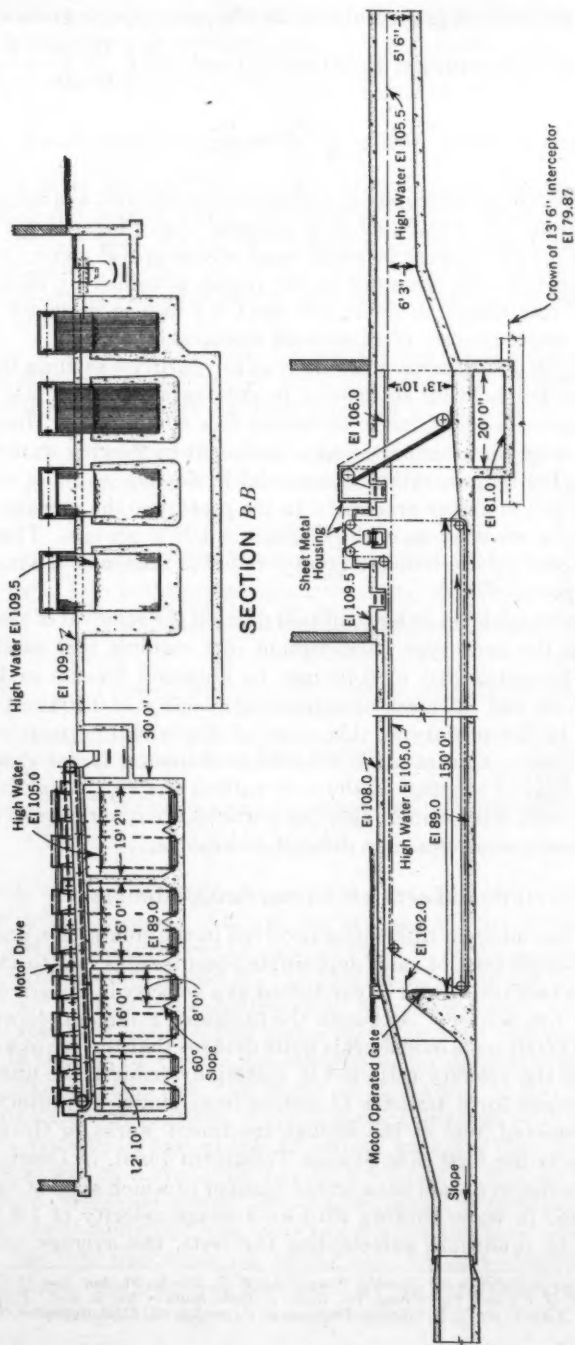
PLAN OF RACKS AND GRIT COLLECTORS, DETROIT SEWAGE TREATMENT PROJECT
